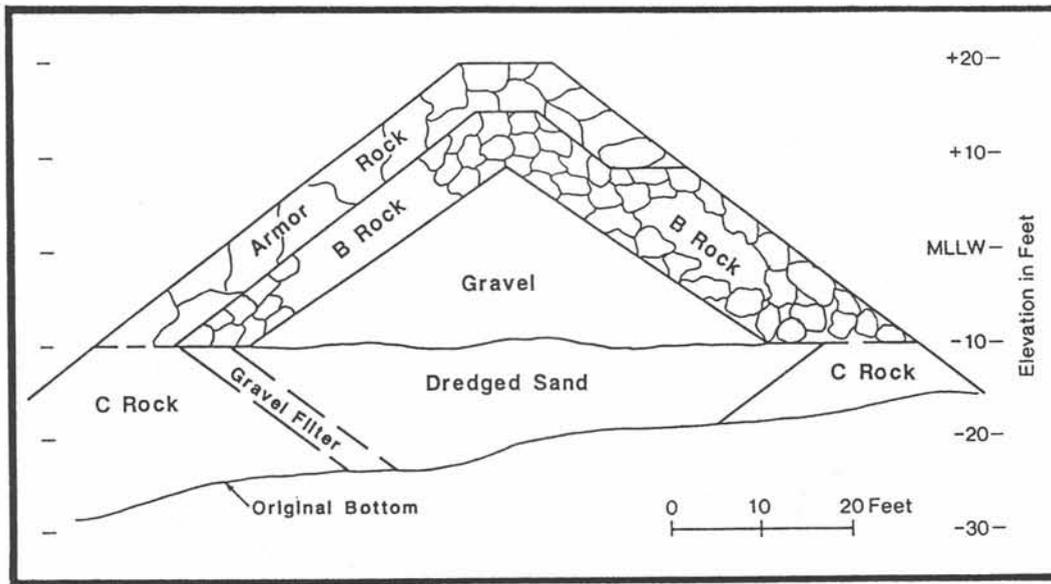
Typical section through the Shilshole Bay breakwater. Placement of dredged sand between C rock submarine dikes was confined to depths greater than -10 ft.
